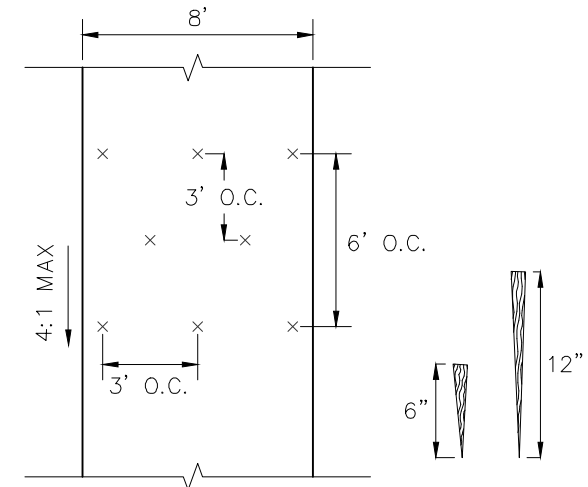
FIGURE D: TOE STAKE SPACING PLAN VIEW – NTS
